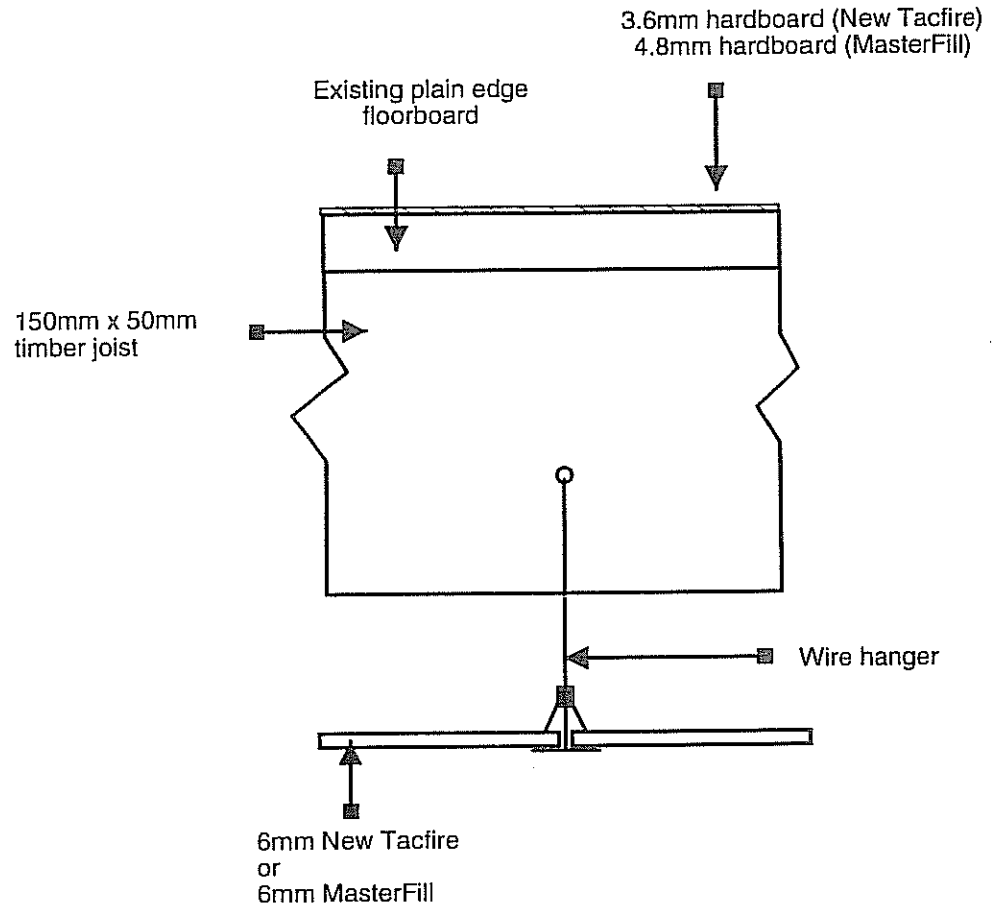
Use of New Tacfire or MasterFill to provide a suspended ceiling of 30 minutes fire resistance
